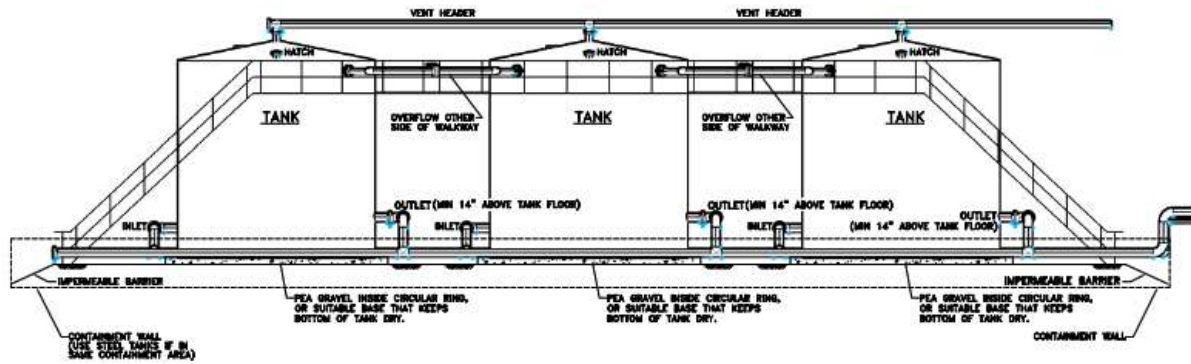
AF.2A—Example Tank Battery Installation Elevation Showing Dike and Example Piping Configuration
